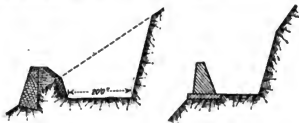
CANALS ON ROCK SLOPE WITH RETAINING WALLS.
